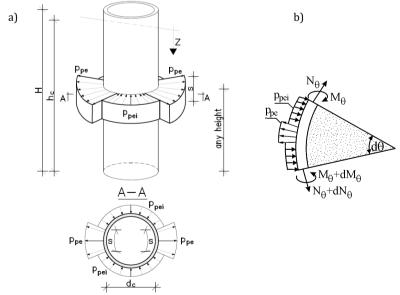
Rules for loading reinforced concrete silo structures with local pressure according to EN 1991-4 [6]: a) distribution of local pressure in the cylindrical silo chamber, b) internal forces in the silo wall structure
